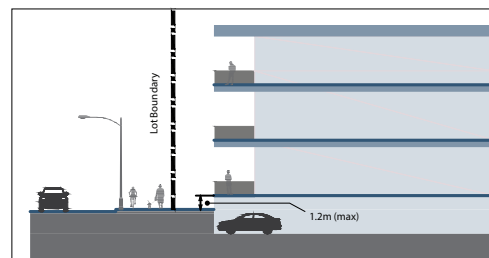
Below grade parking, residential or non-residential ground floor use. Wholly underground parking may be located with nil setback to lot boundaries, provided it does not interfere with deep soil areas.
